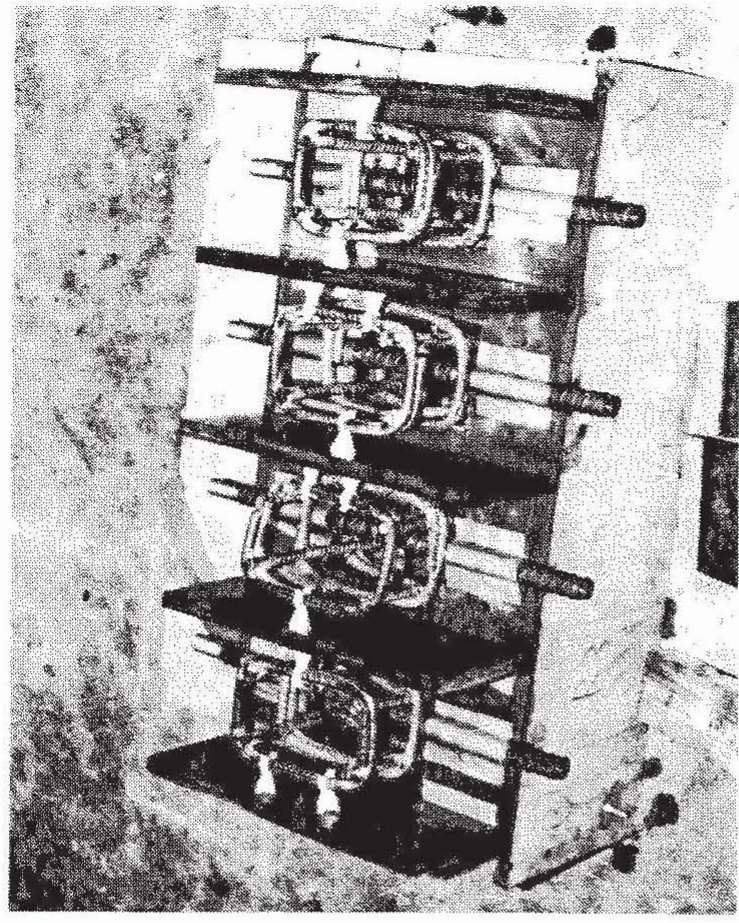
PHOTO OF SPECIMENS PRIOR TO CASTING
